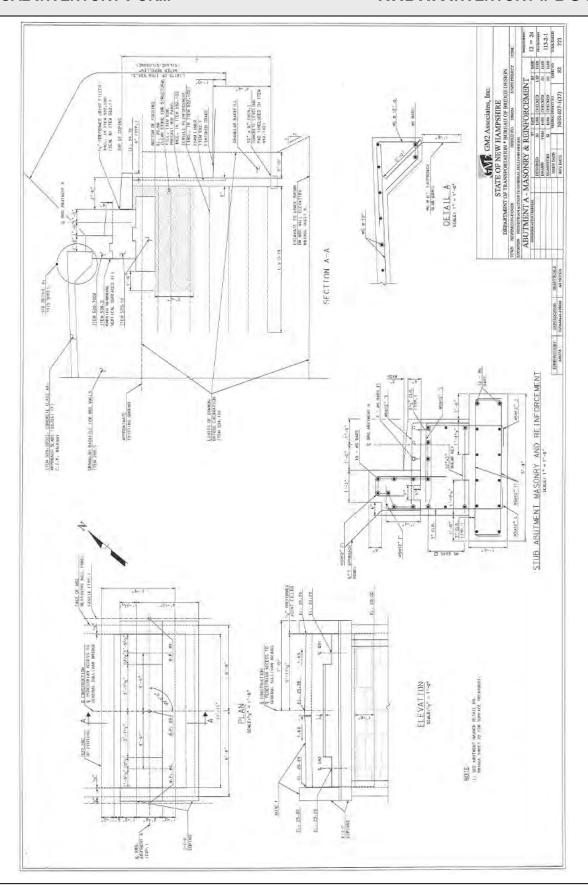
2009 plans for the new north bridge approach and abutment modification, Abutment A – Masonry & Reinforcement.
